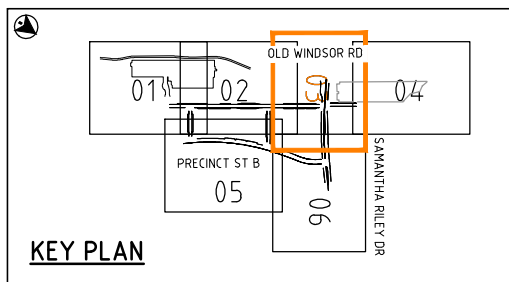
NRT STORMWATER CATCHMENT PLANS - KELLYVILLE
